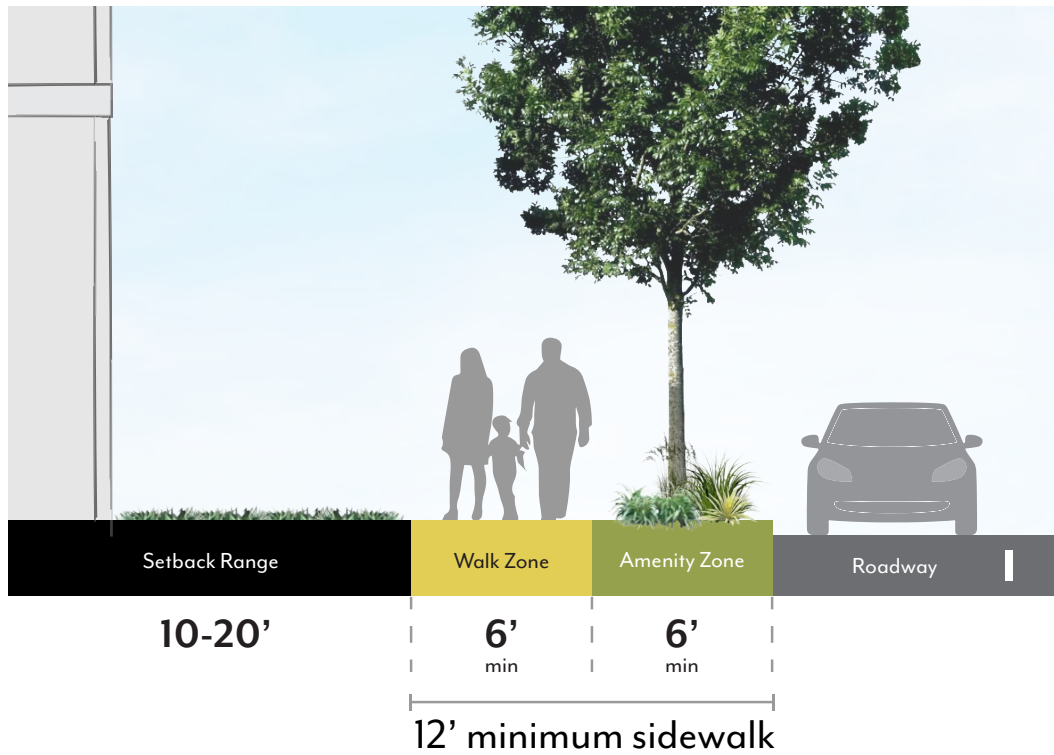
Sidewalks - Mixed Use Corridor (MUC) Typical or Curb Extension Condition
